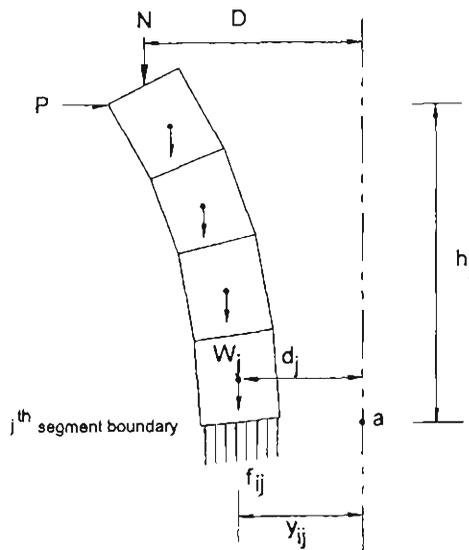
Equilibrium Equations for the Cantilevered Wall
